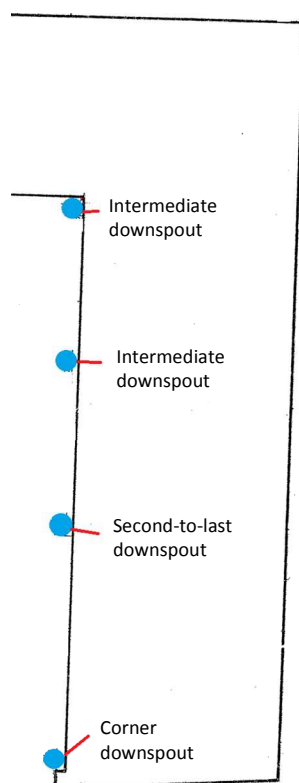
Accepted spacing and diameters of downspouts on the east façade
